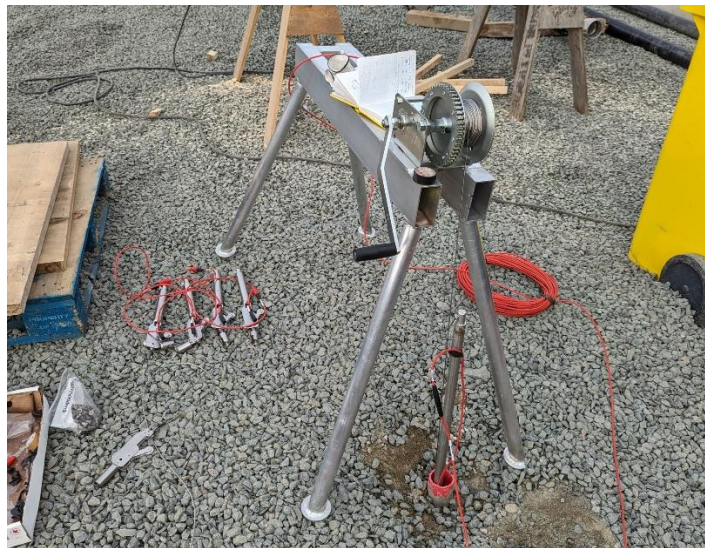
HOSS for Lowering Bay Assembly into the Inclinometer Casing
